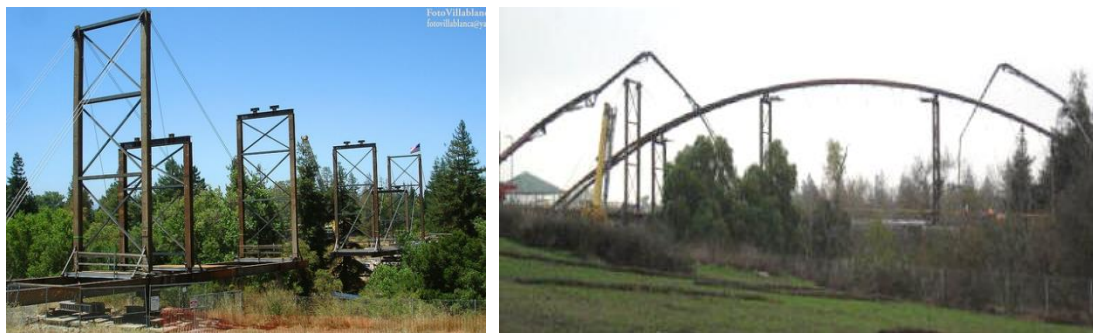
Construction of Happy Hollow Zoo pedestrian bridge
